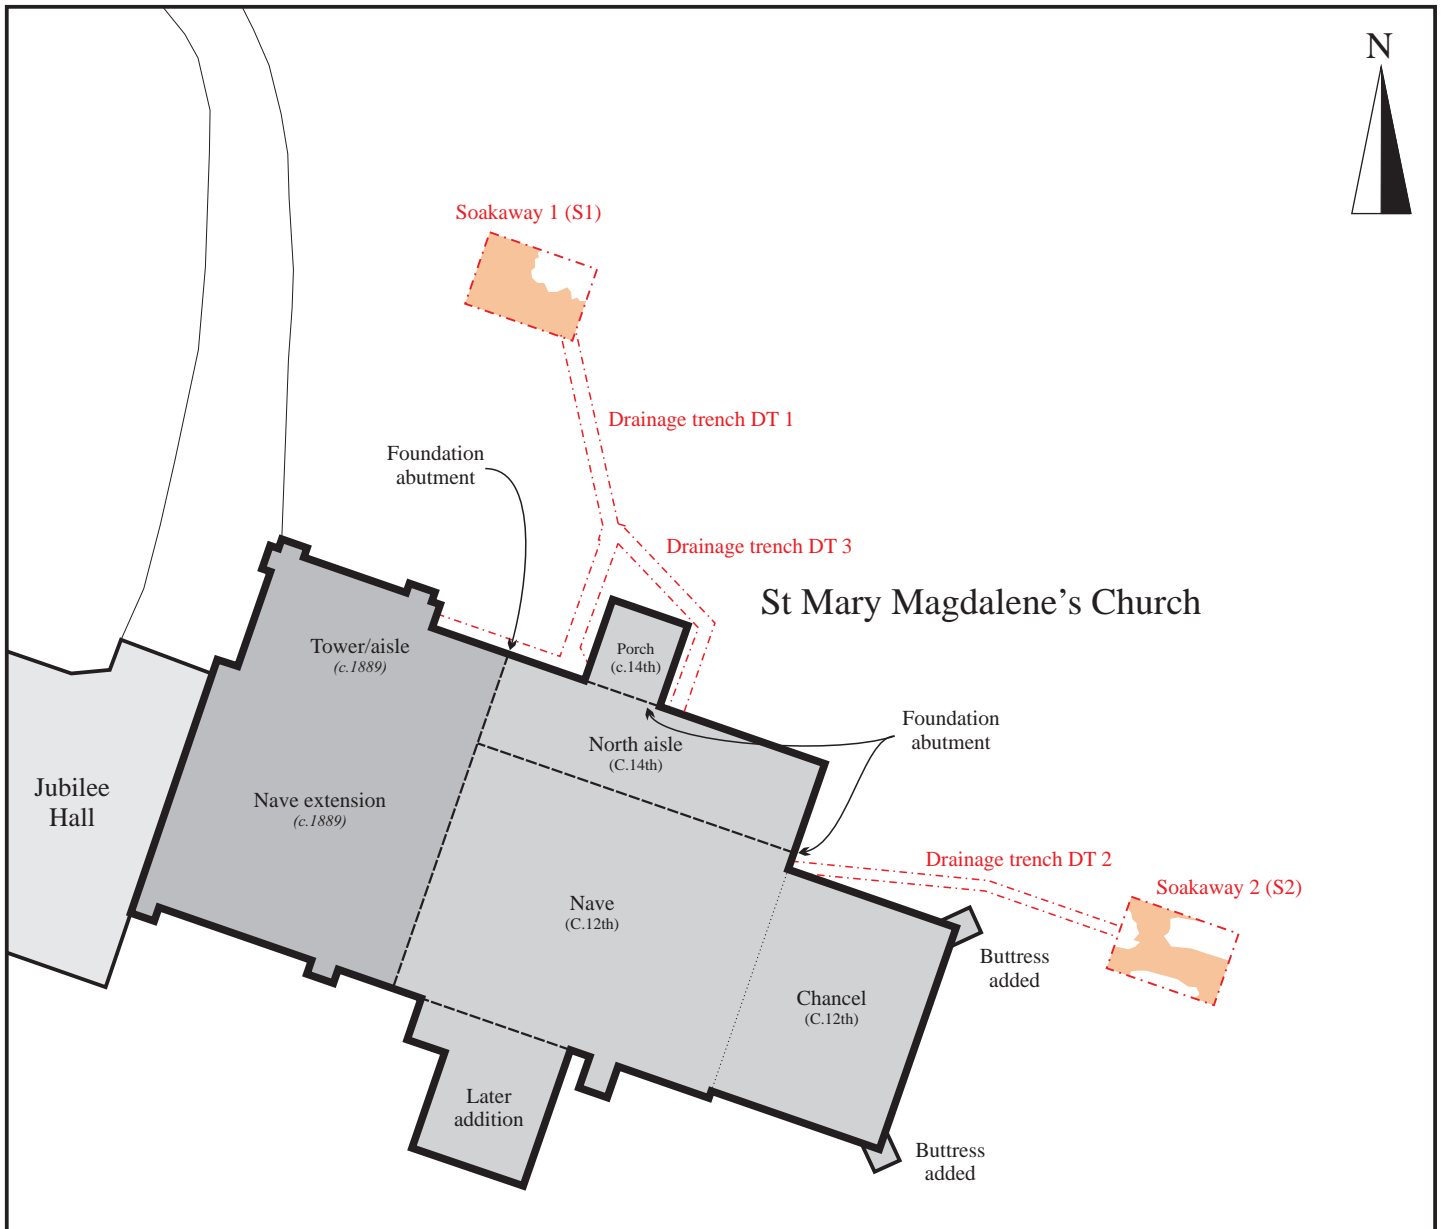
Plan of St Mary's Church, Main Road, Longfield and its immediate churchyard showing the alignments of new drainage trenching (DT 1-3) and soakaway positions (S1 and S2) in relation to the existing church.
